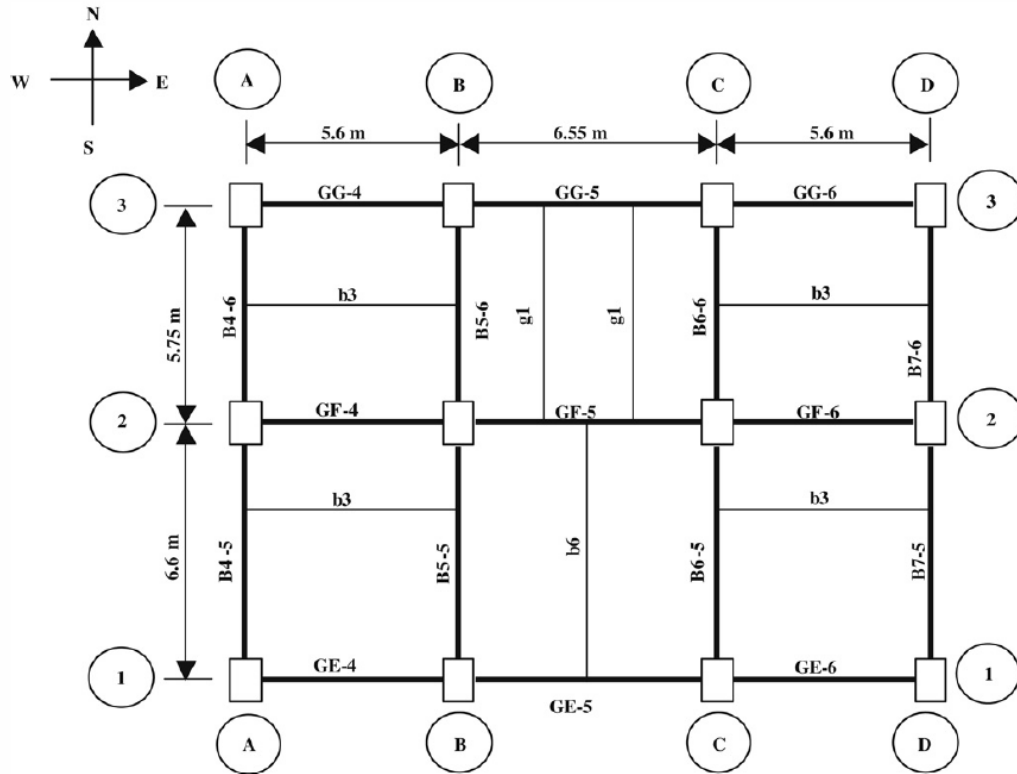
Plan view of the building (Tsai and Lin 2008)
